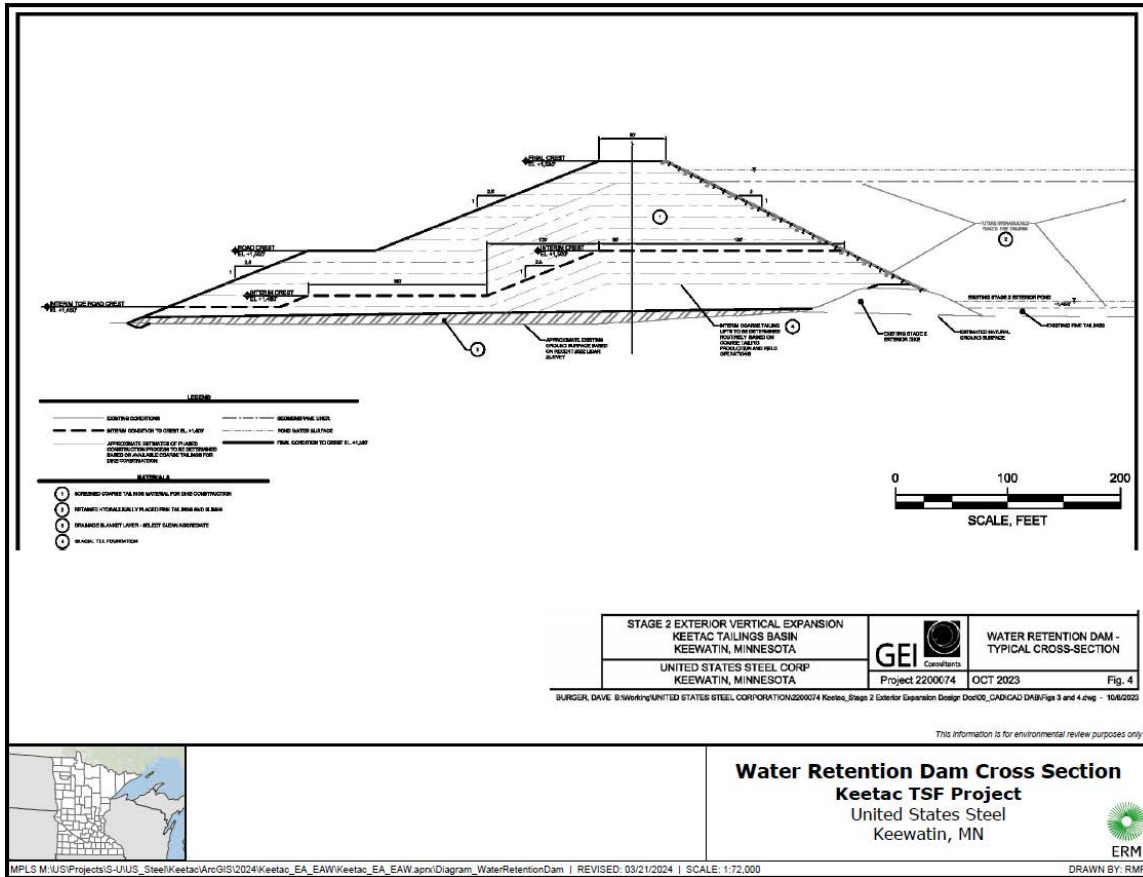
WATER RETENTION DAM TYPICAL CROSS SECTION—DOWNSTREAM CONSTRUCTION
